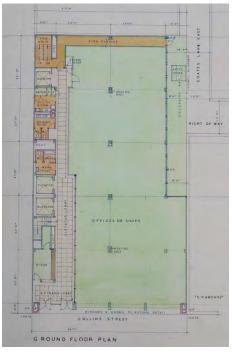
Ground floor plan. Drawing by J A La Gerche, dated June 1957 (BAP).
